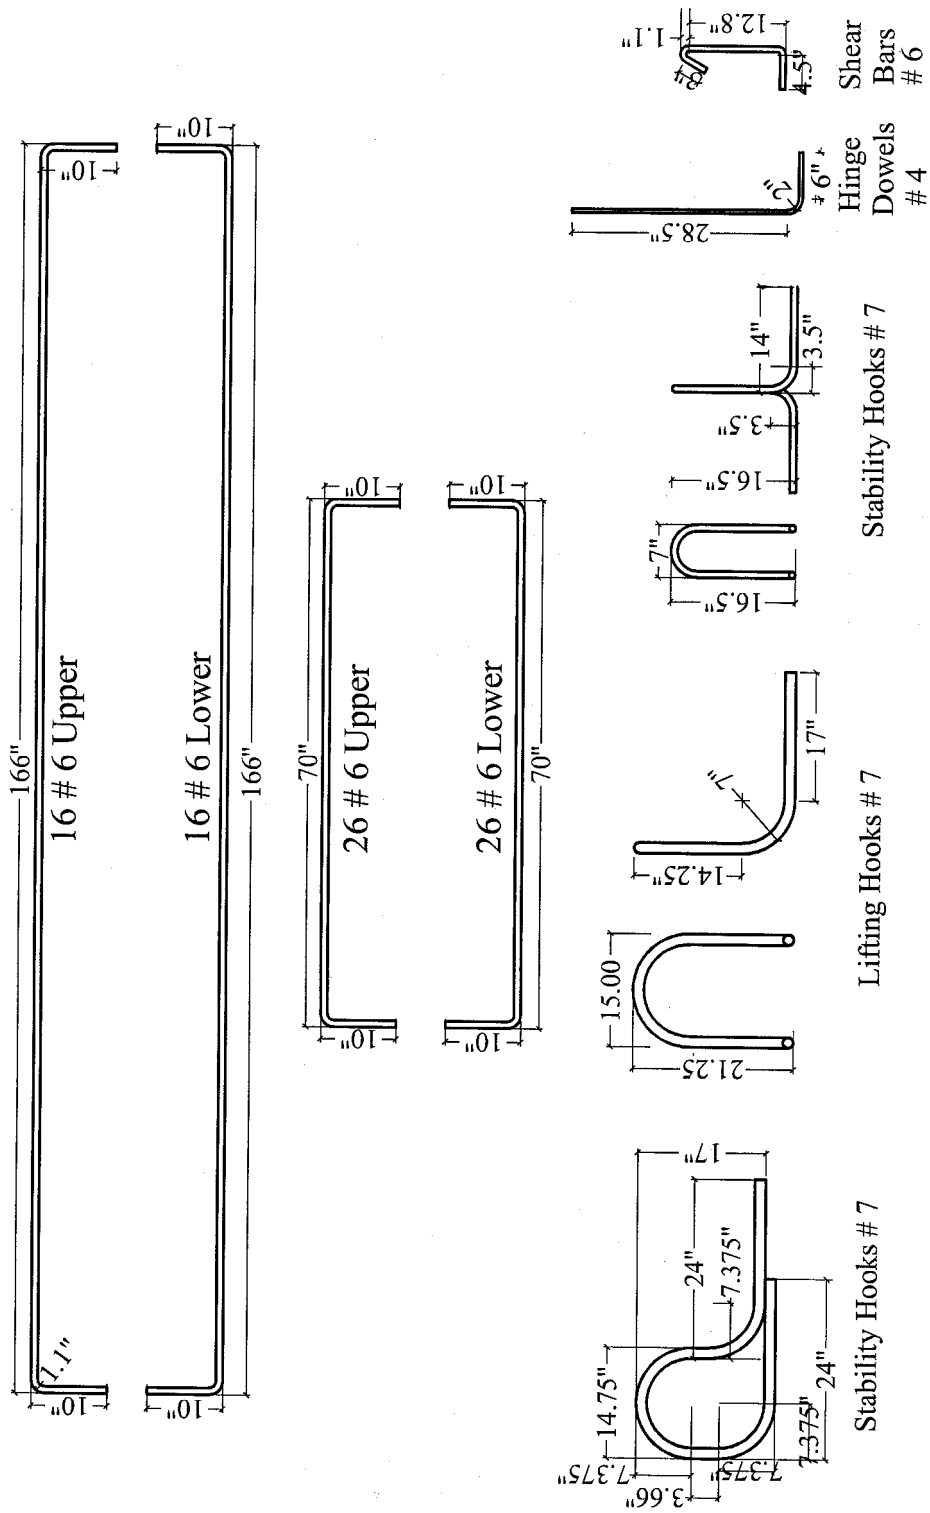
Details of Footing Reinforcement for All Specimens (English Units)
